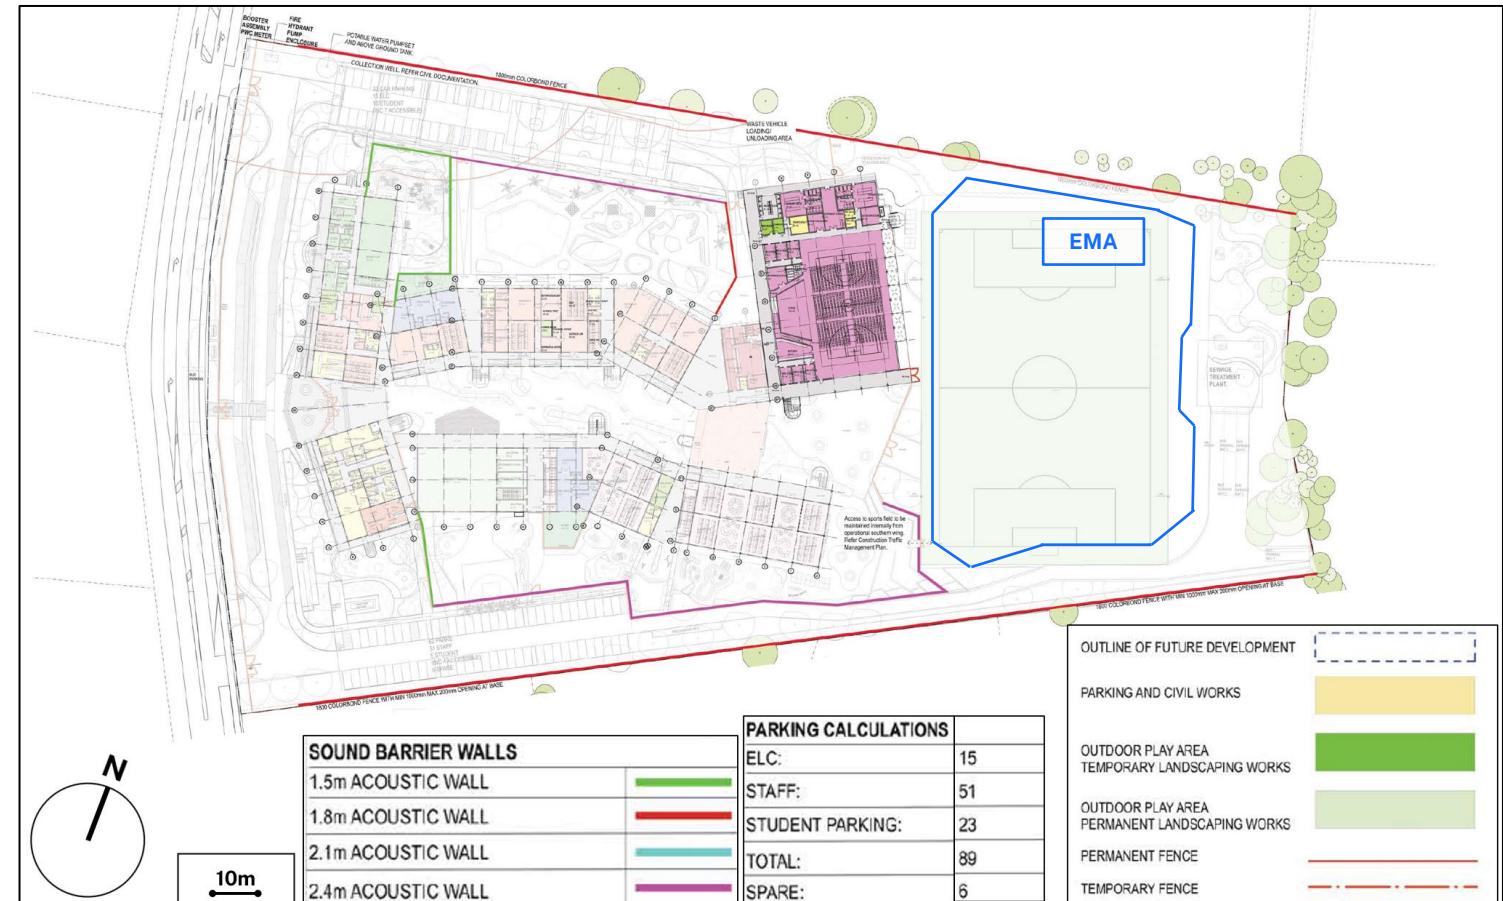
Ground Floor Plan (Source: Applicant's ARtS, 2025)
